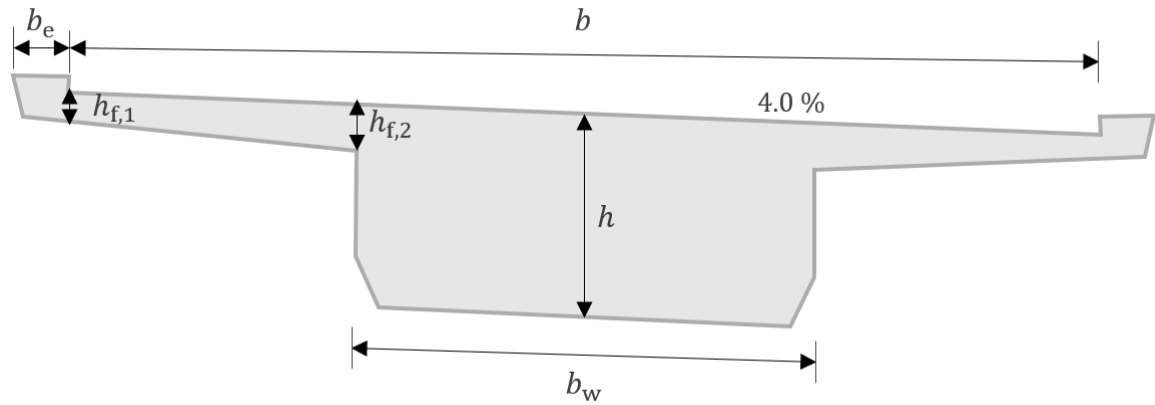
Cross-section geometry for the T-section of the road bridge, Halvors länk.
